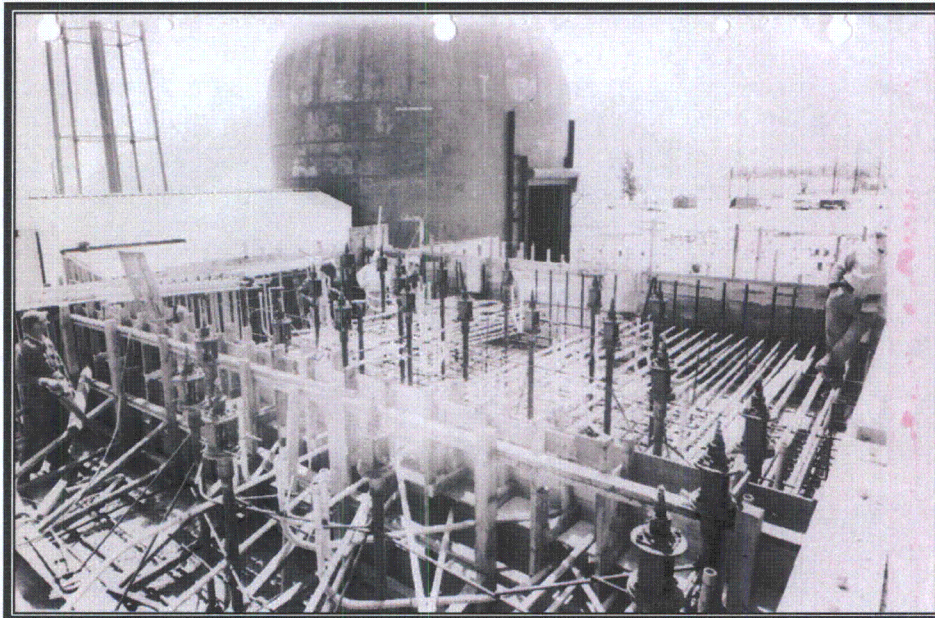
Construction photograph of pouring roof of sodium service building (Courtesy DECo)
